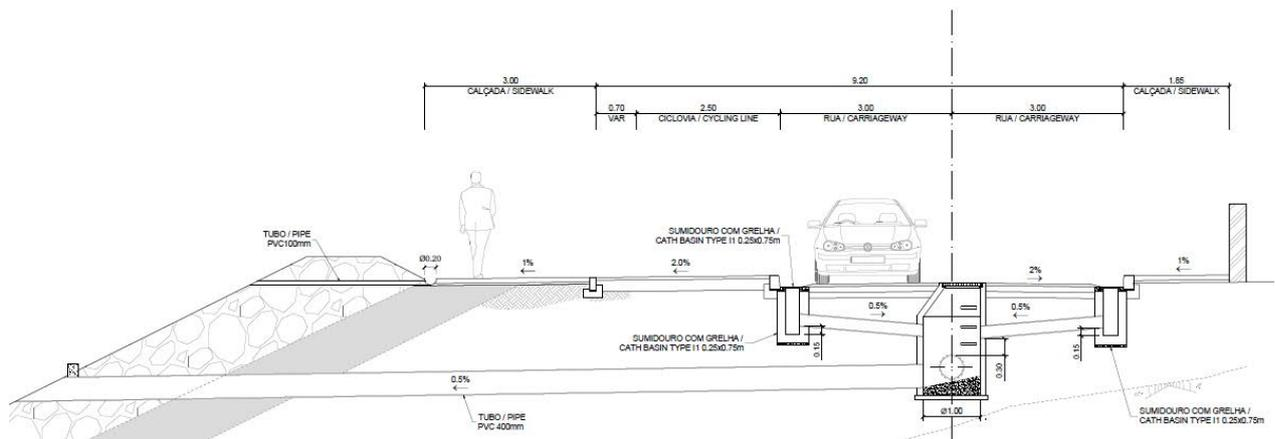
Typical section Ana Chaves Bay (2+760 – 4+540).
